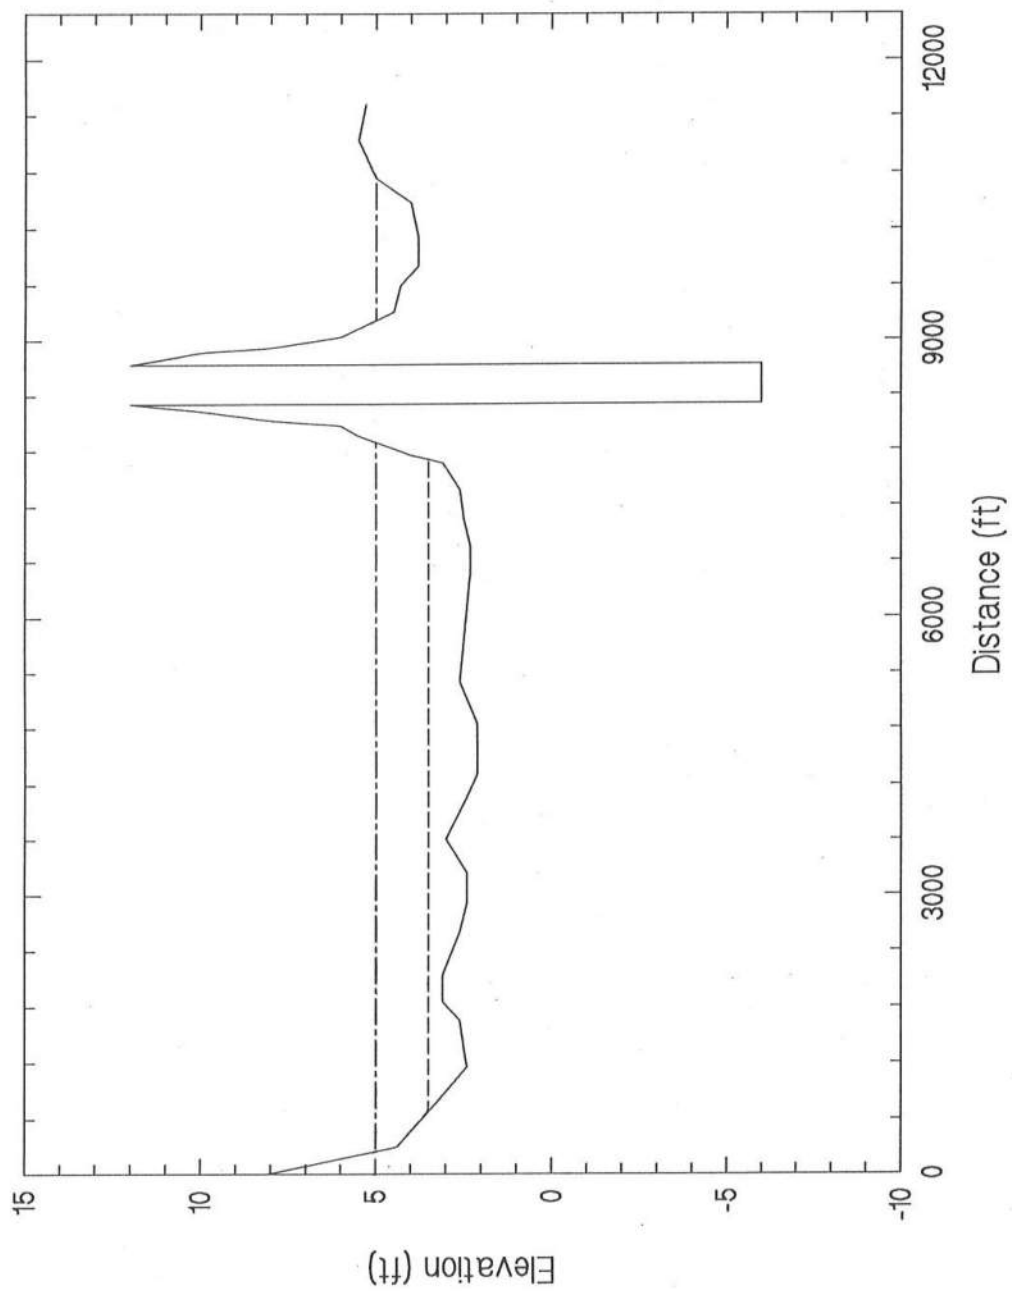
Existing Cross Section Geometry at Node 32 and Minimum Fill
